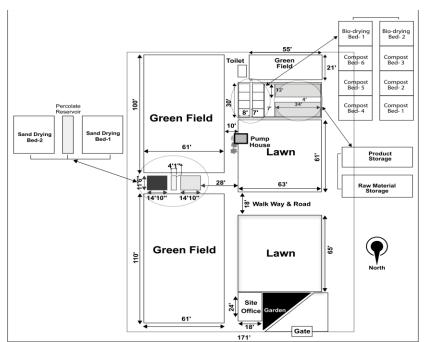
Plot plan of pilot-scale dewatering and composting units at Purbapara, Gazipur.
